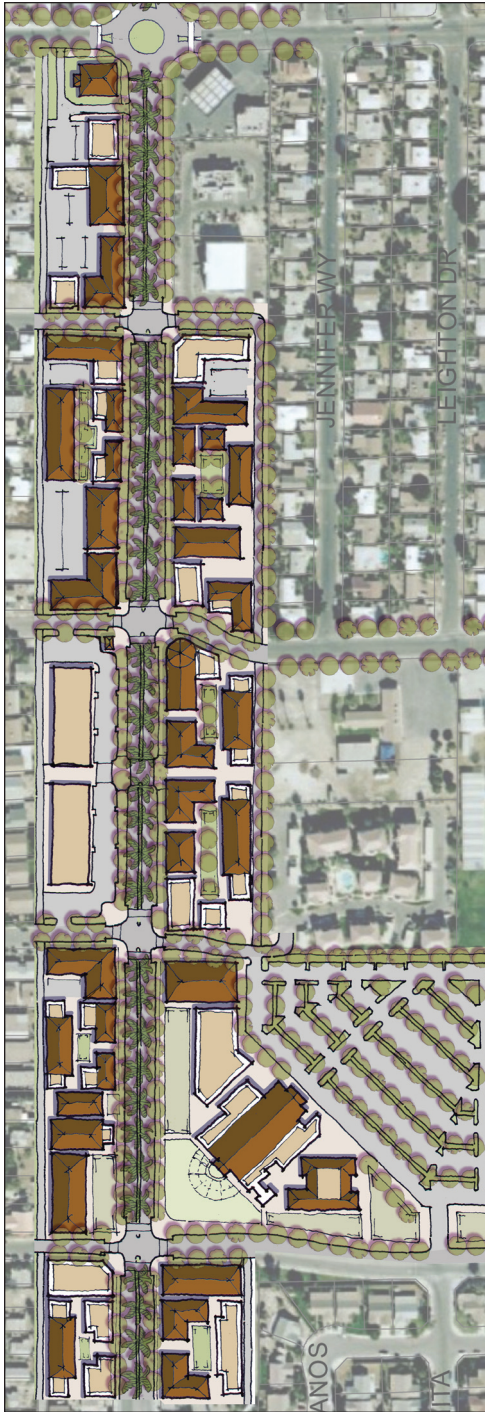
Roundabout design layout for Harrison Avenue and Avenue 52.
